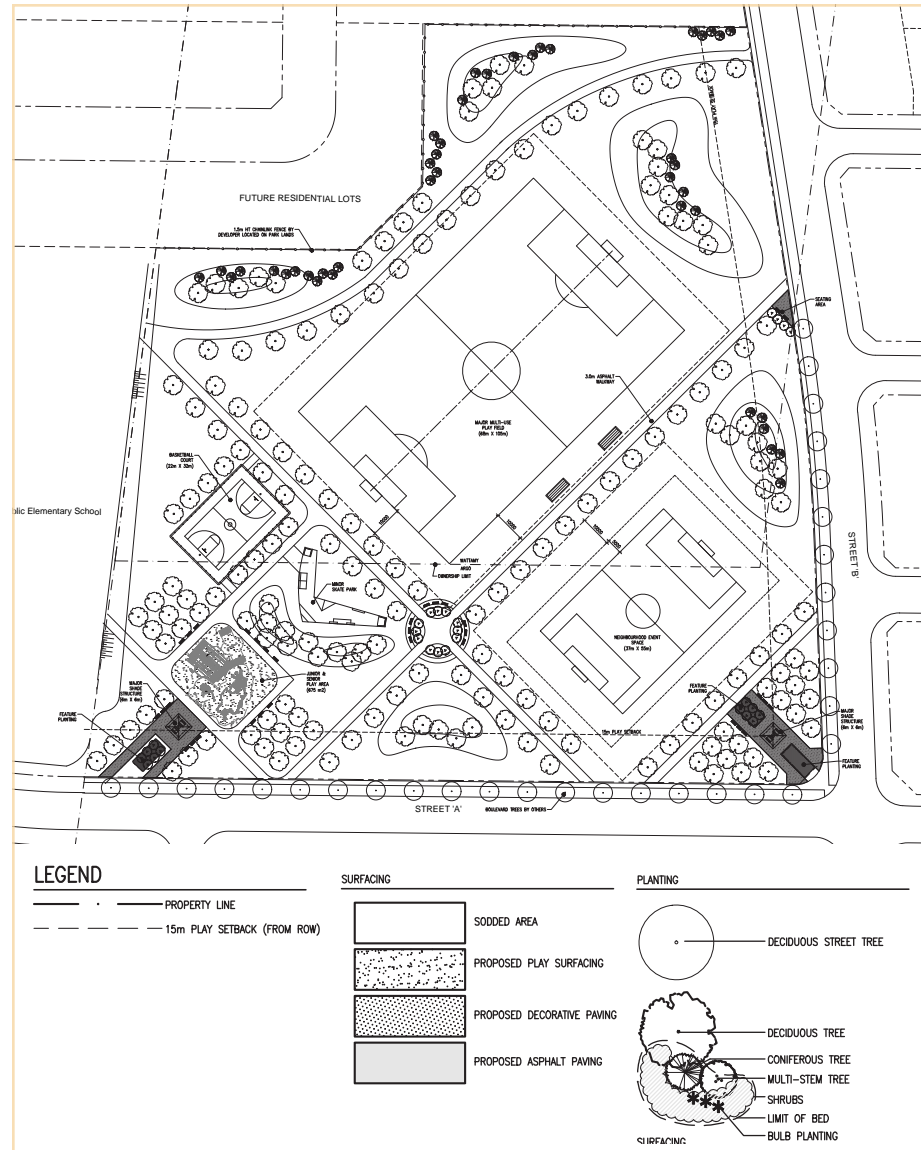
Facility Fit Plan for the south Neighbourhood Park with a portion of the park located outside of the Joshua Creek Phase 3
